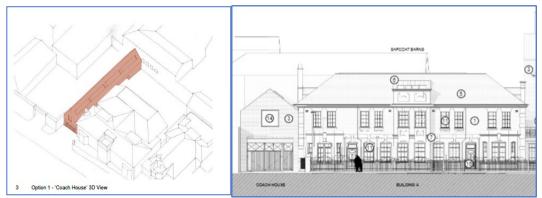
Location of Coach House and its appearance from Summer Hill Terrace
